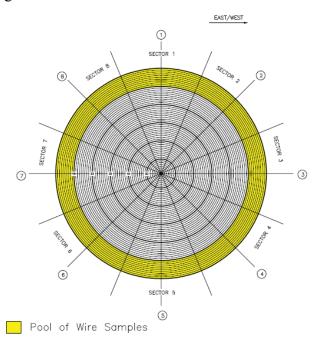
Eight-Wedge Pattern and Pool of Wire Samples in Cable Cross-Section
